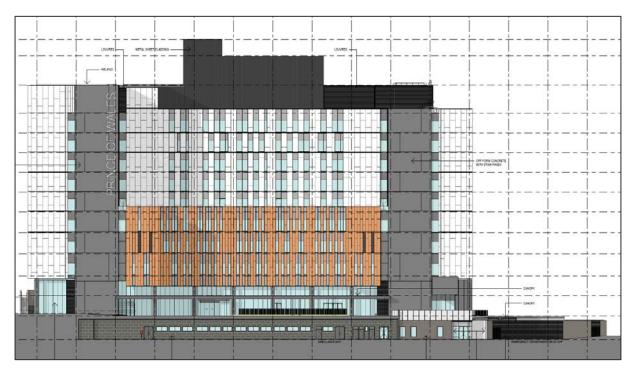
| Western elevation to Botany Street – main entrance (Source: RtS)
